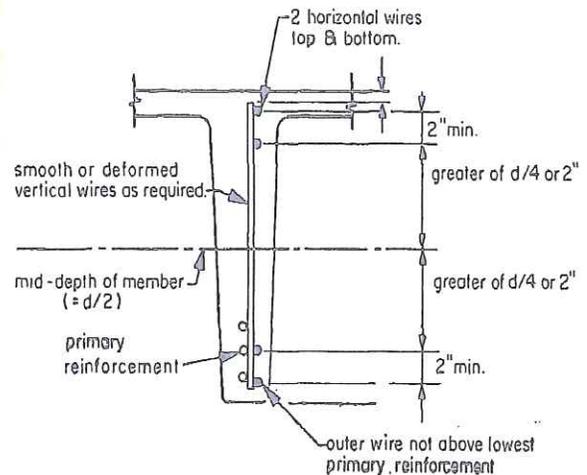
Anchorage of Single-Leg Welded Wire Fabric Shear Reinforcement, ACI (1989)
